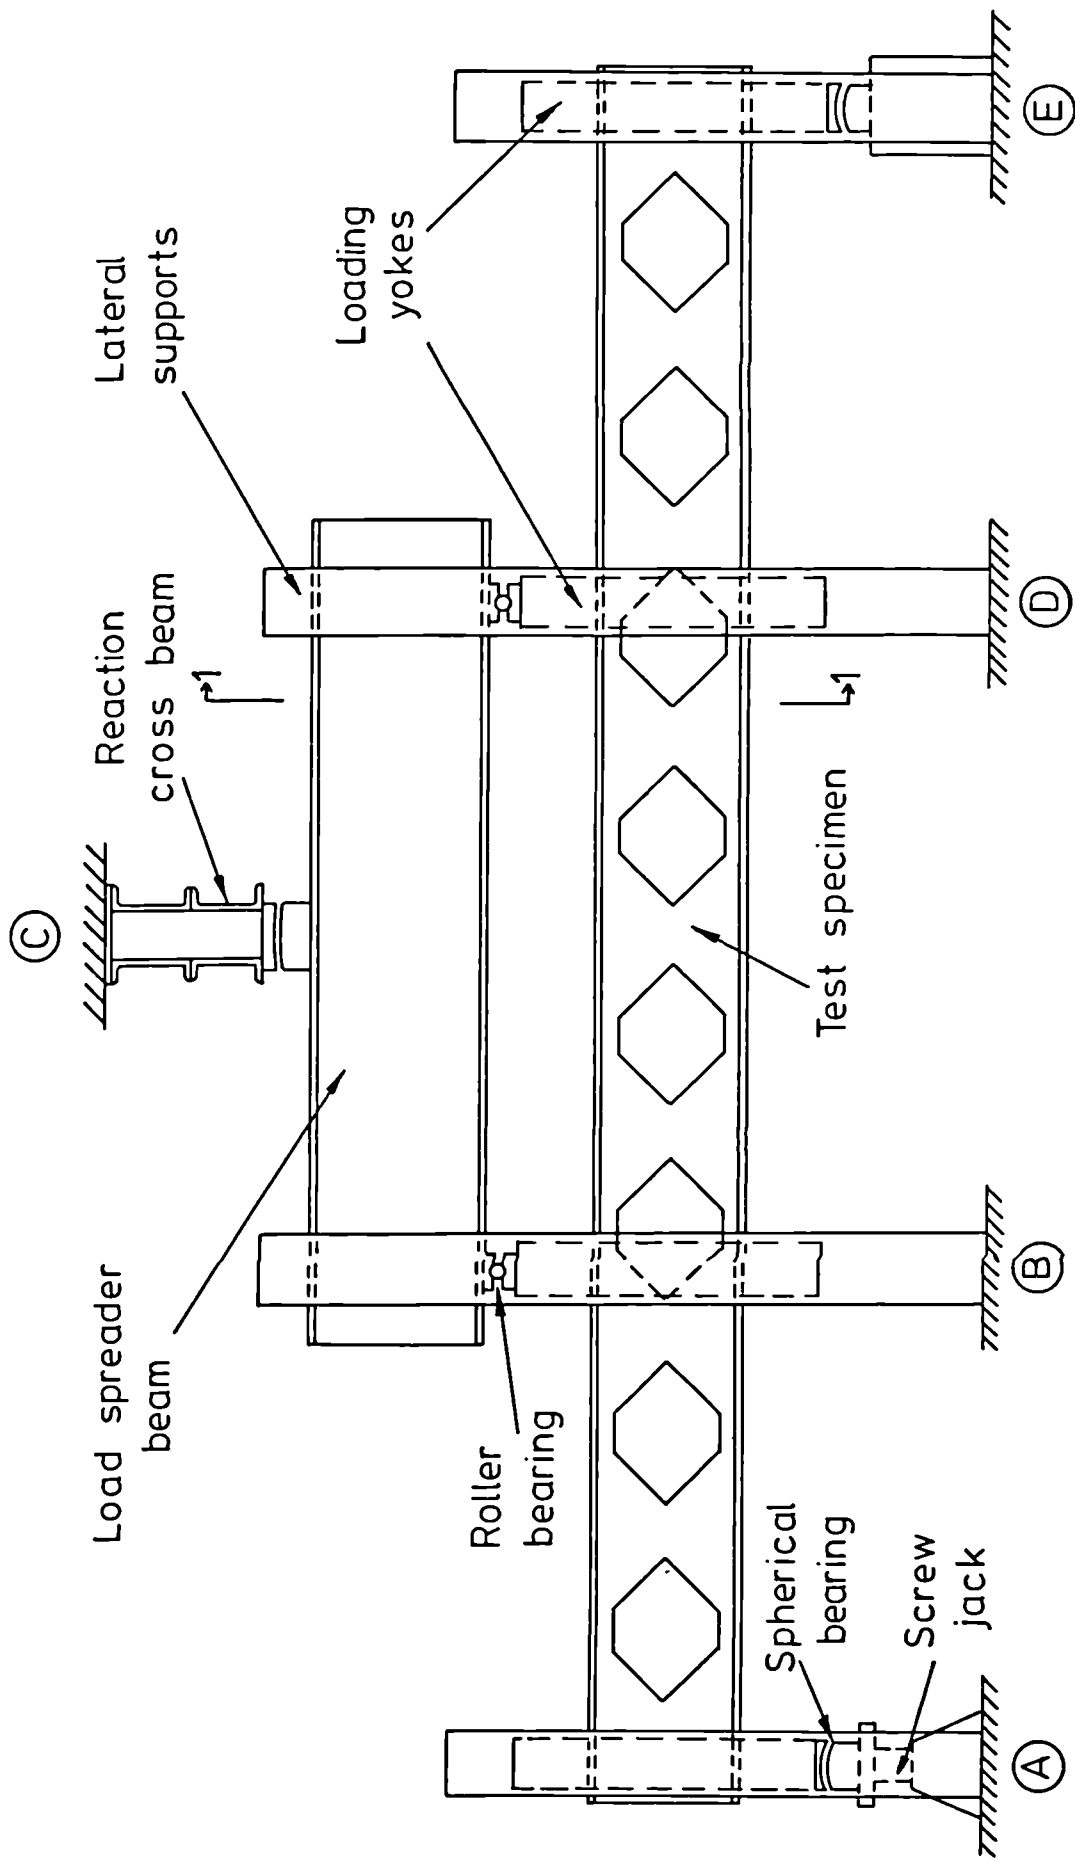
SCHEMATIC ARRANGEMENT OF TEST RIG.
